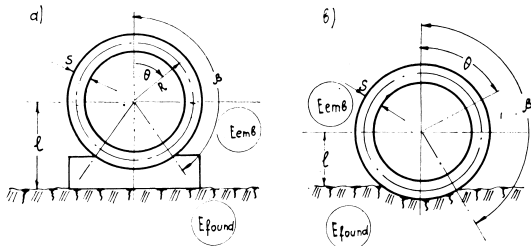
(a) Section through pipe laid on a concrete bed; (b) section through pipe laid directly on natural ground.
